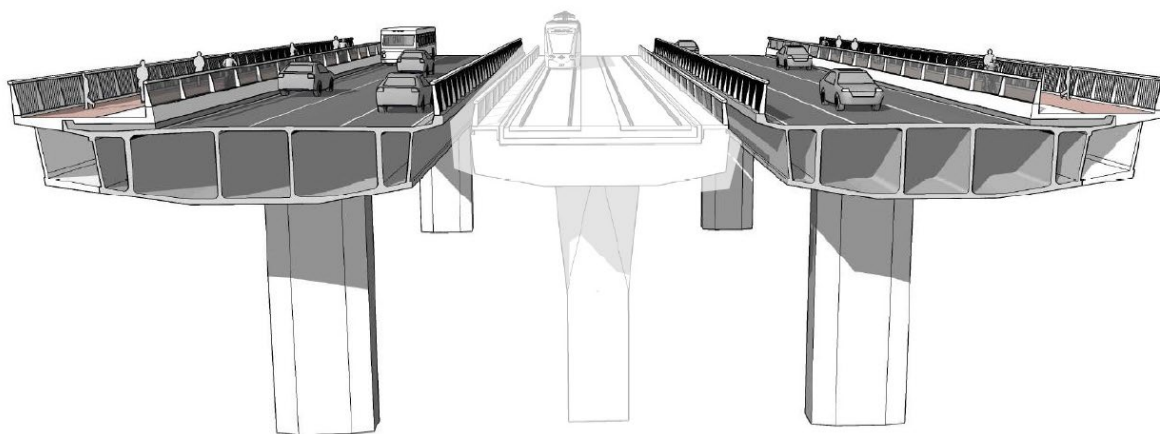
An artist's impression of the Commonwealth Avenue Bridge renewal works showing an indicative bridge to accommodate the future Light Rail, further design work by the ACT Government to be undertaken
